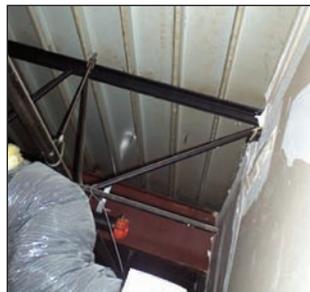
Gypsum board separating the second floor plenum from the soffit has been installed with a good fit around structural steel and sealed with joint compound.
